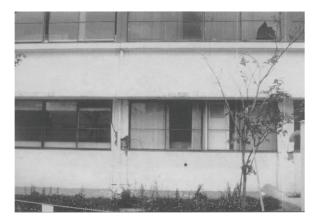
Captive Column Failure, Japan, Miyagi-ken-oki, 1978
